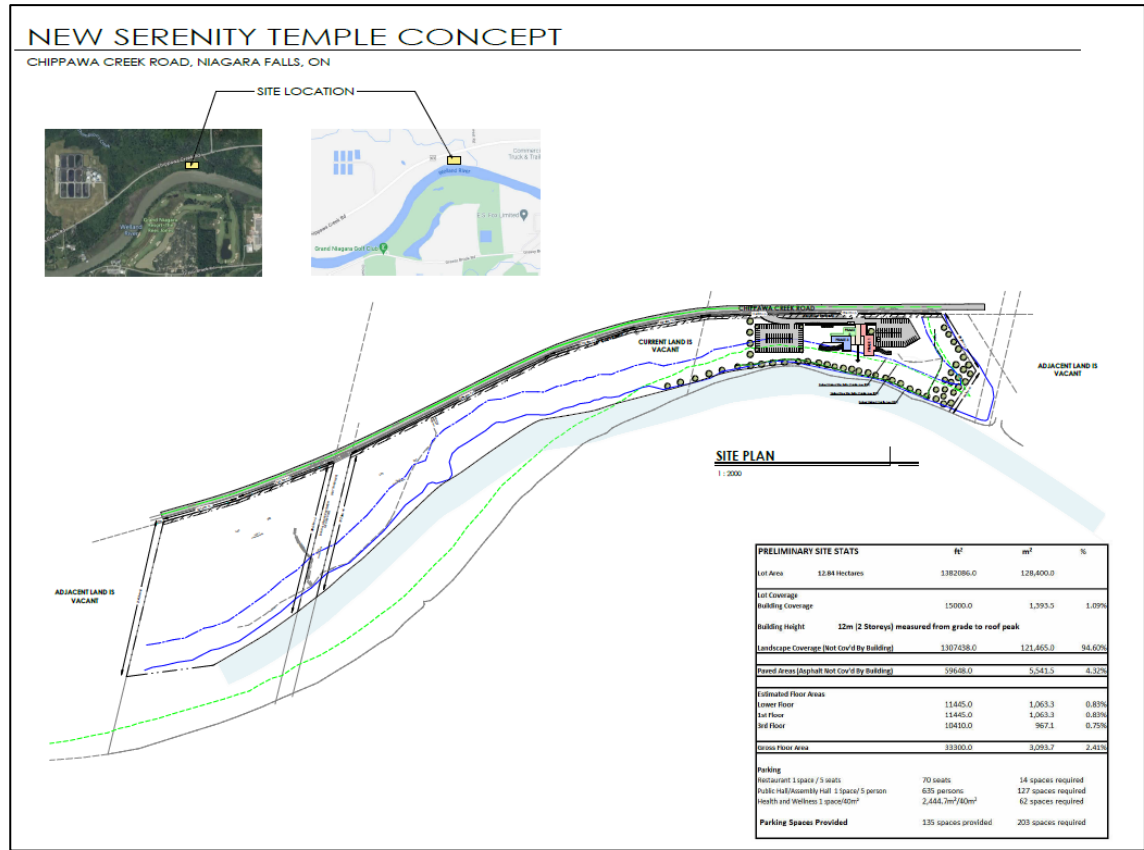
Proposed Concept Plan, Prepared by ACK
